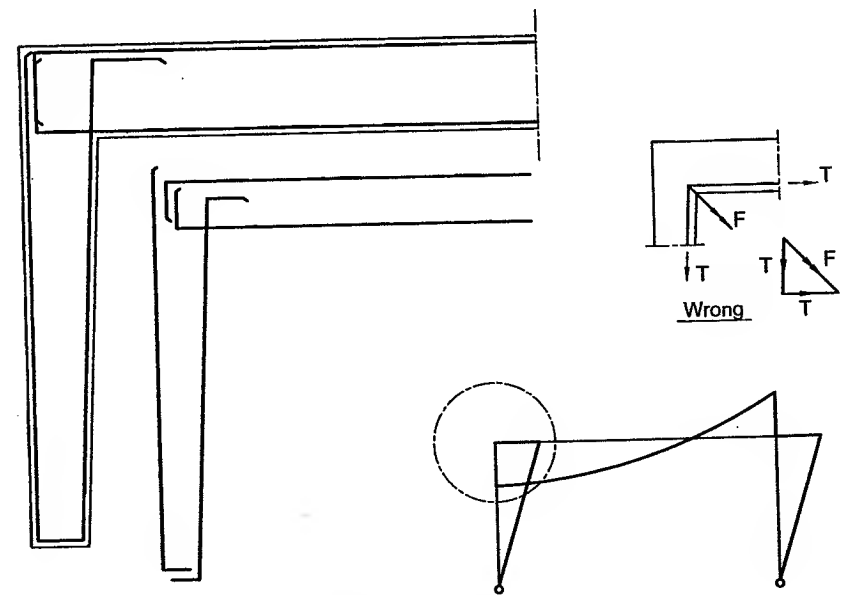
Detailing of Frame Joints (Detail-4)
